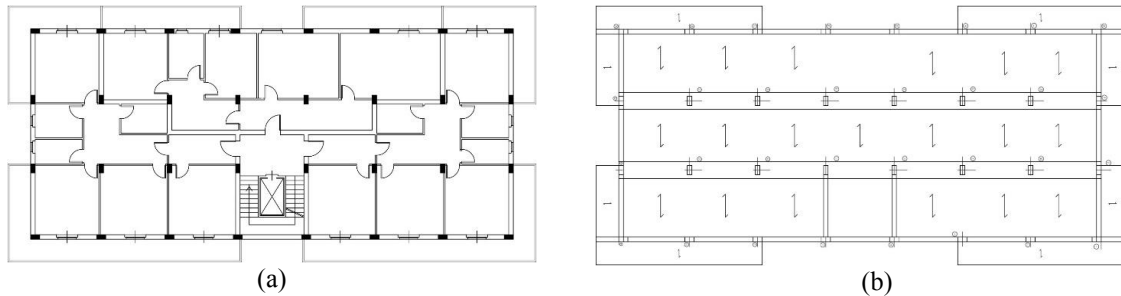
Architectural (a) and structural (b) plan of the typical building.
